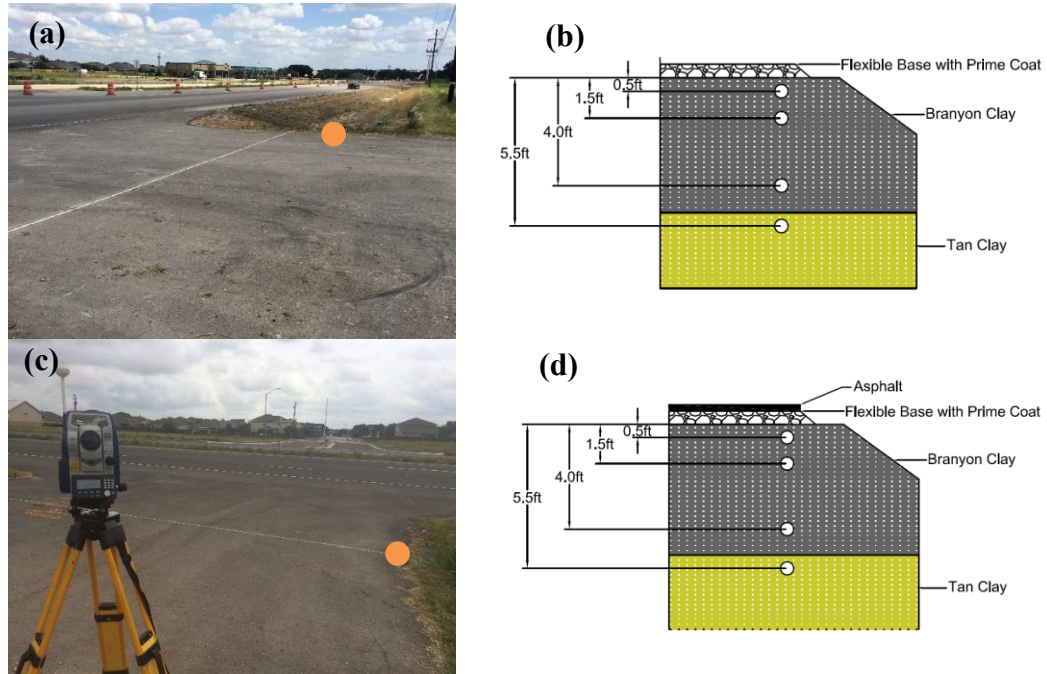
FM 685 site: (a) Pavement with flexible base surface, (b) Site layout for flexible base surface, (c) Pavement after asphalt placement, (d) Site layout for asphalt surface
